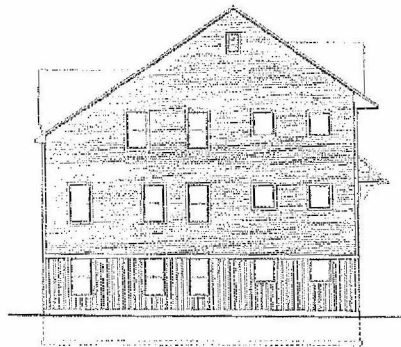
# Exhibit D-Proposed Elevations for Buildings A,B,C,D and F Route 202, Windham, Maine Village at Little Falls
